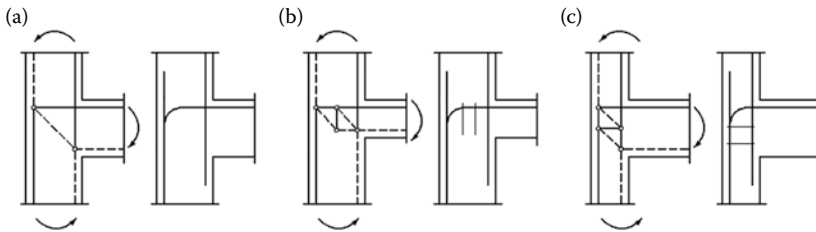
Suggested *STMs* and corresponding details for exterior beam–column connection with beam to column thickness: (a) between 0.67 and 1.5, (b) less than 0.67, and (c) greater than 1.5.
